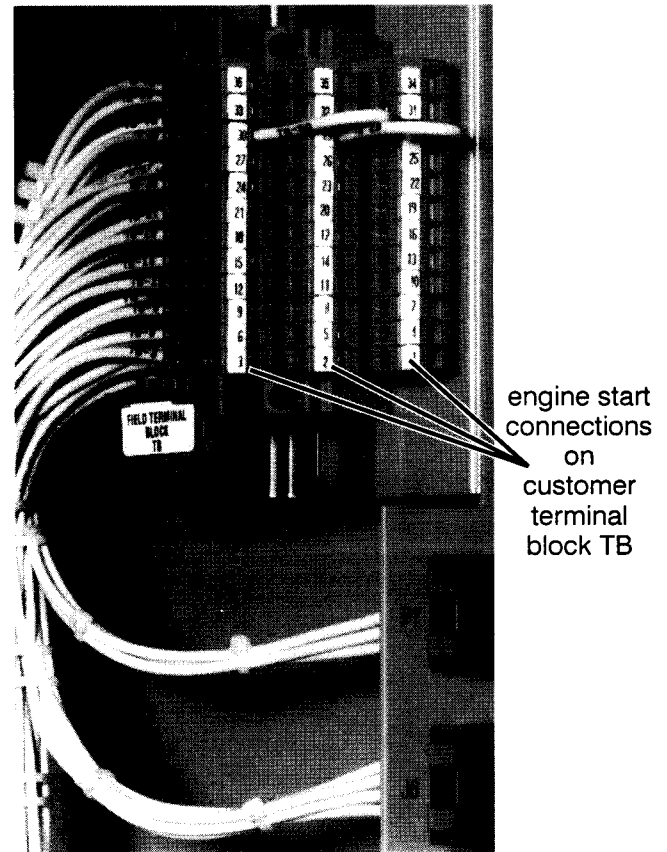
Customer terminal block on the top right side of the enclosure.
